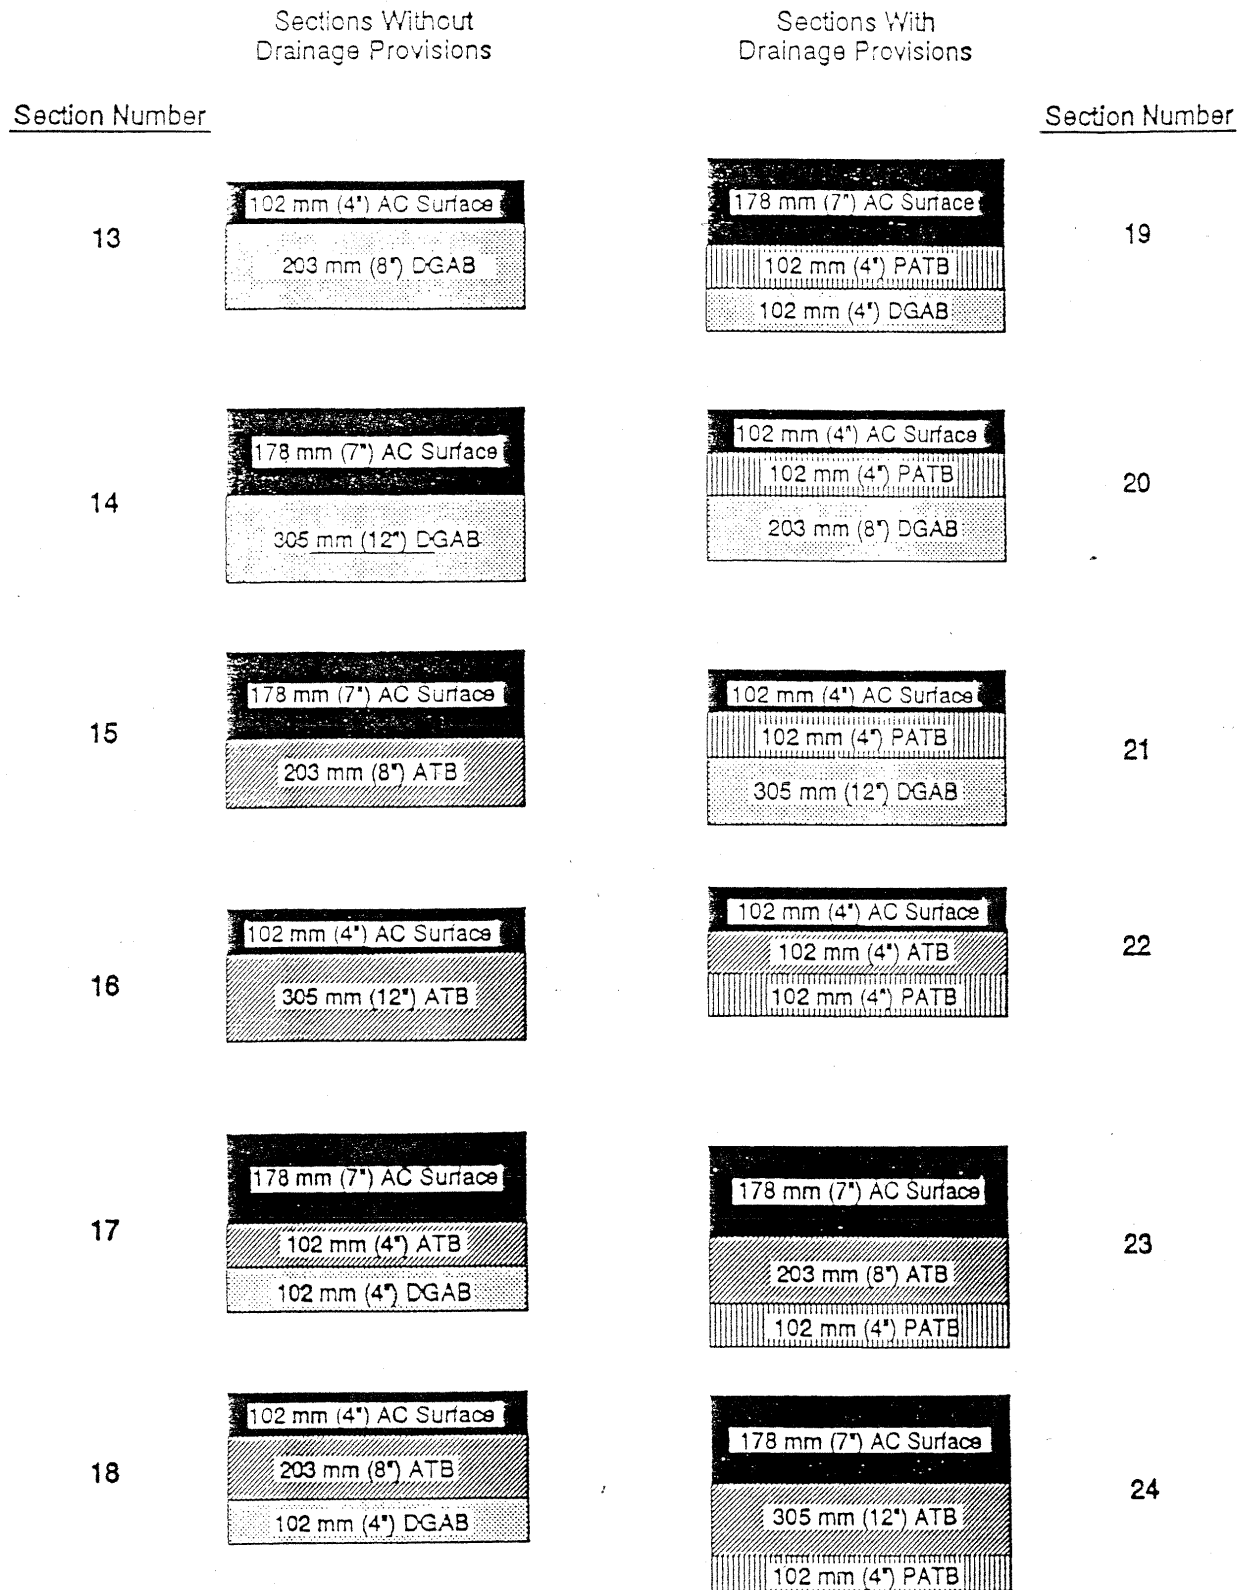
Pavement Cross Sections for an SPS - 1 Test Site with Test Sections 13 through 24
